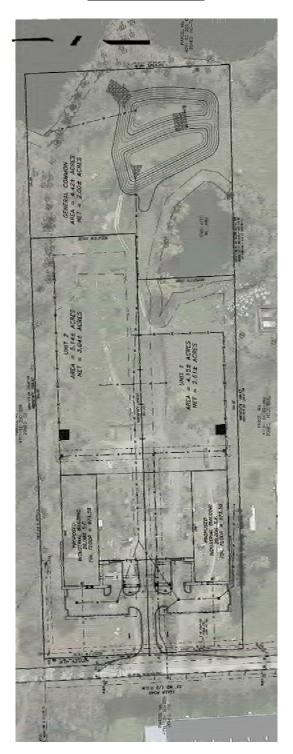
PHOTO DEPICTING SITE IMPROVEMENTS NOT TO SCALE
